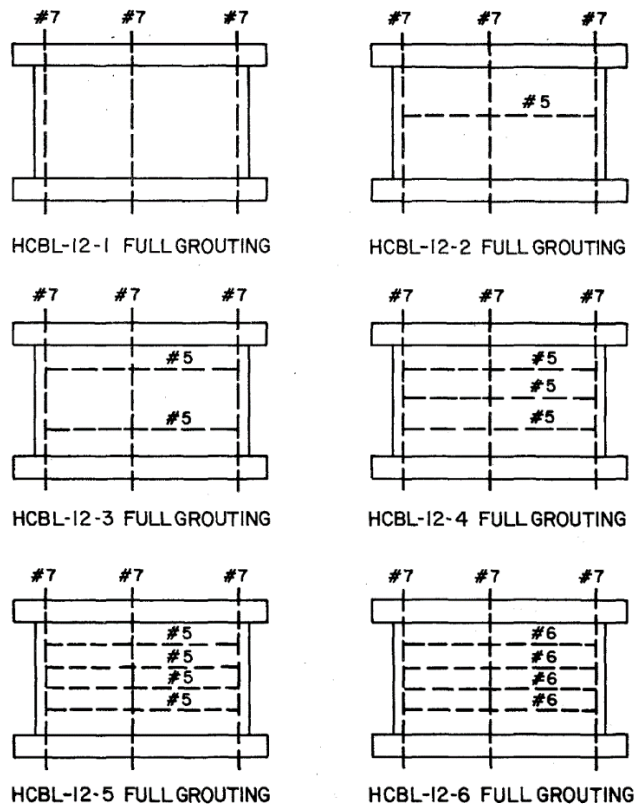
Single-Pier Specimen Reinforcing Details (Hidalgo et al., 1979)
